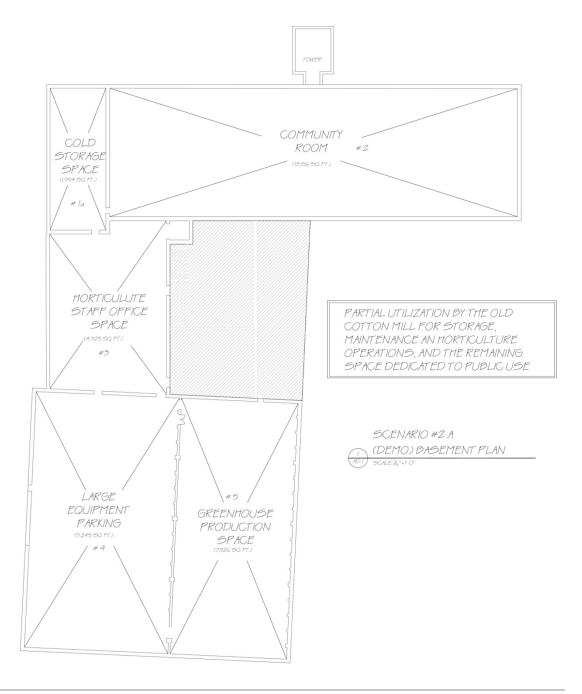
Retail and Storage operation - Option 2A Basement Plan
